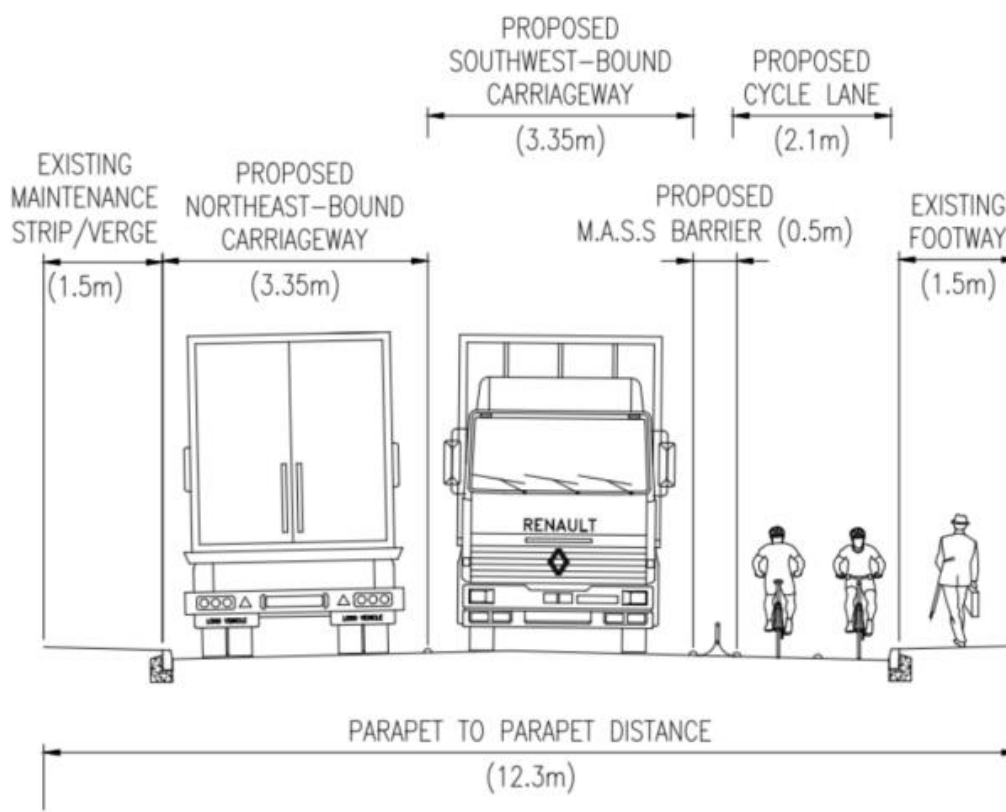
Extract from WSP's Options Report showing proposed cross section
